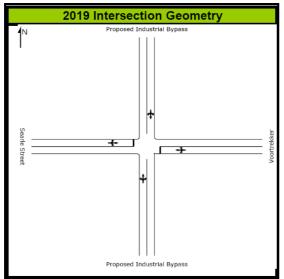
Proposed geometry of Industrial Bypass / Searle Street / Voortrekker Road intersection
